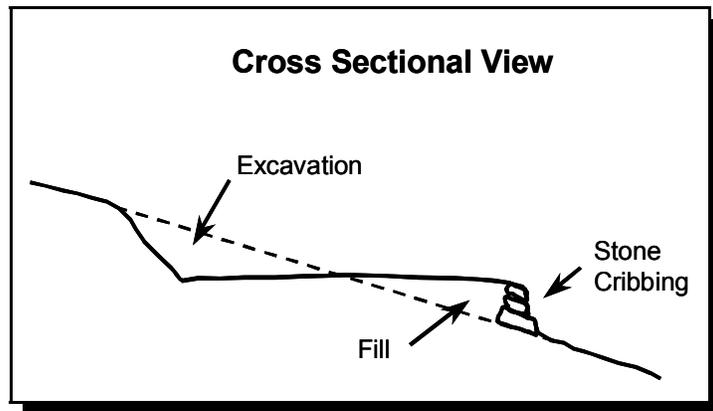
Cross sectional view of a side-hill constructed tent pad. Surface should be slightly crowned in all directions for water drainage.
